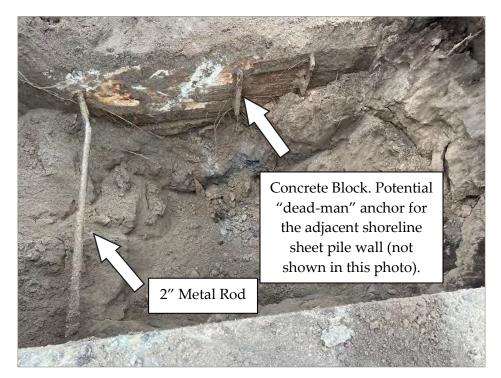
Area 8 – View of the West Half Final Extent of the Excavation. Photo taken on October 5, 2021. View direction is east. A metal rod and concrete block were observed in the excavation and are potential structural components of the adjacent sheet pile wall.
